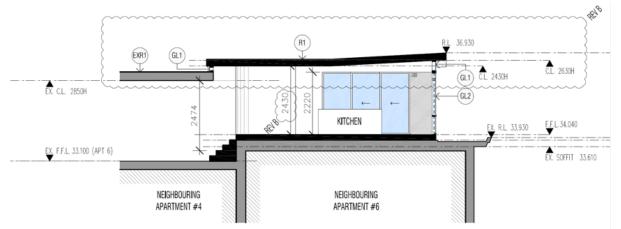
Proposed section diagram showing the proposed raised structural zone.
